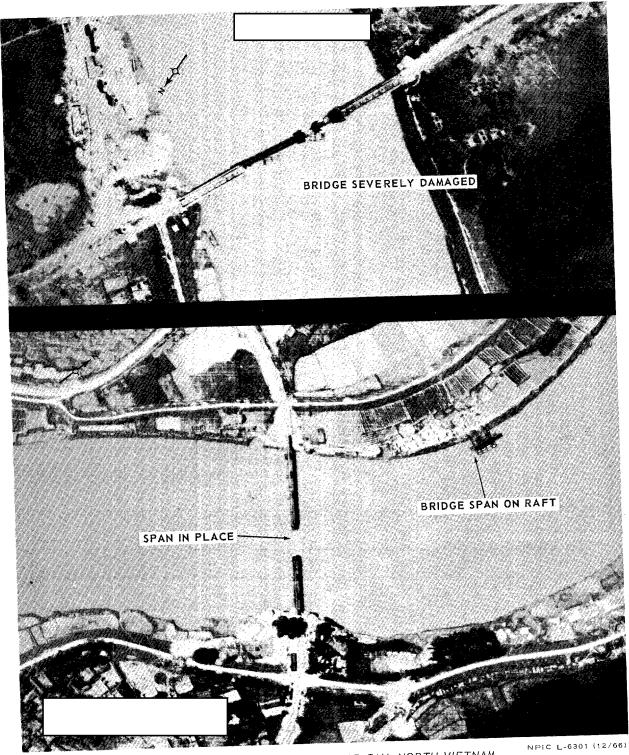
RAILROAD BRIDGES, DAP CAU, NORTH VIETNAM
